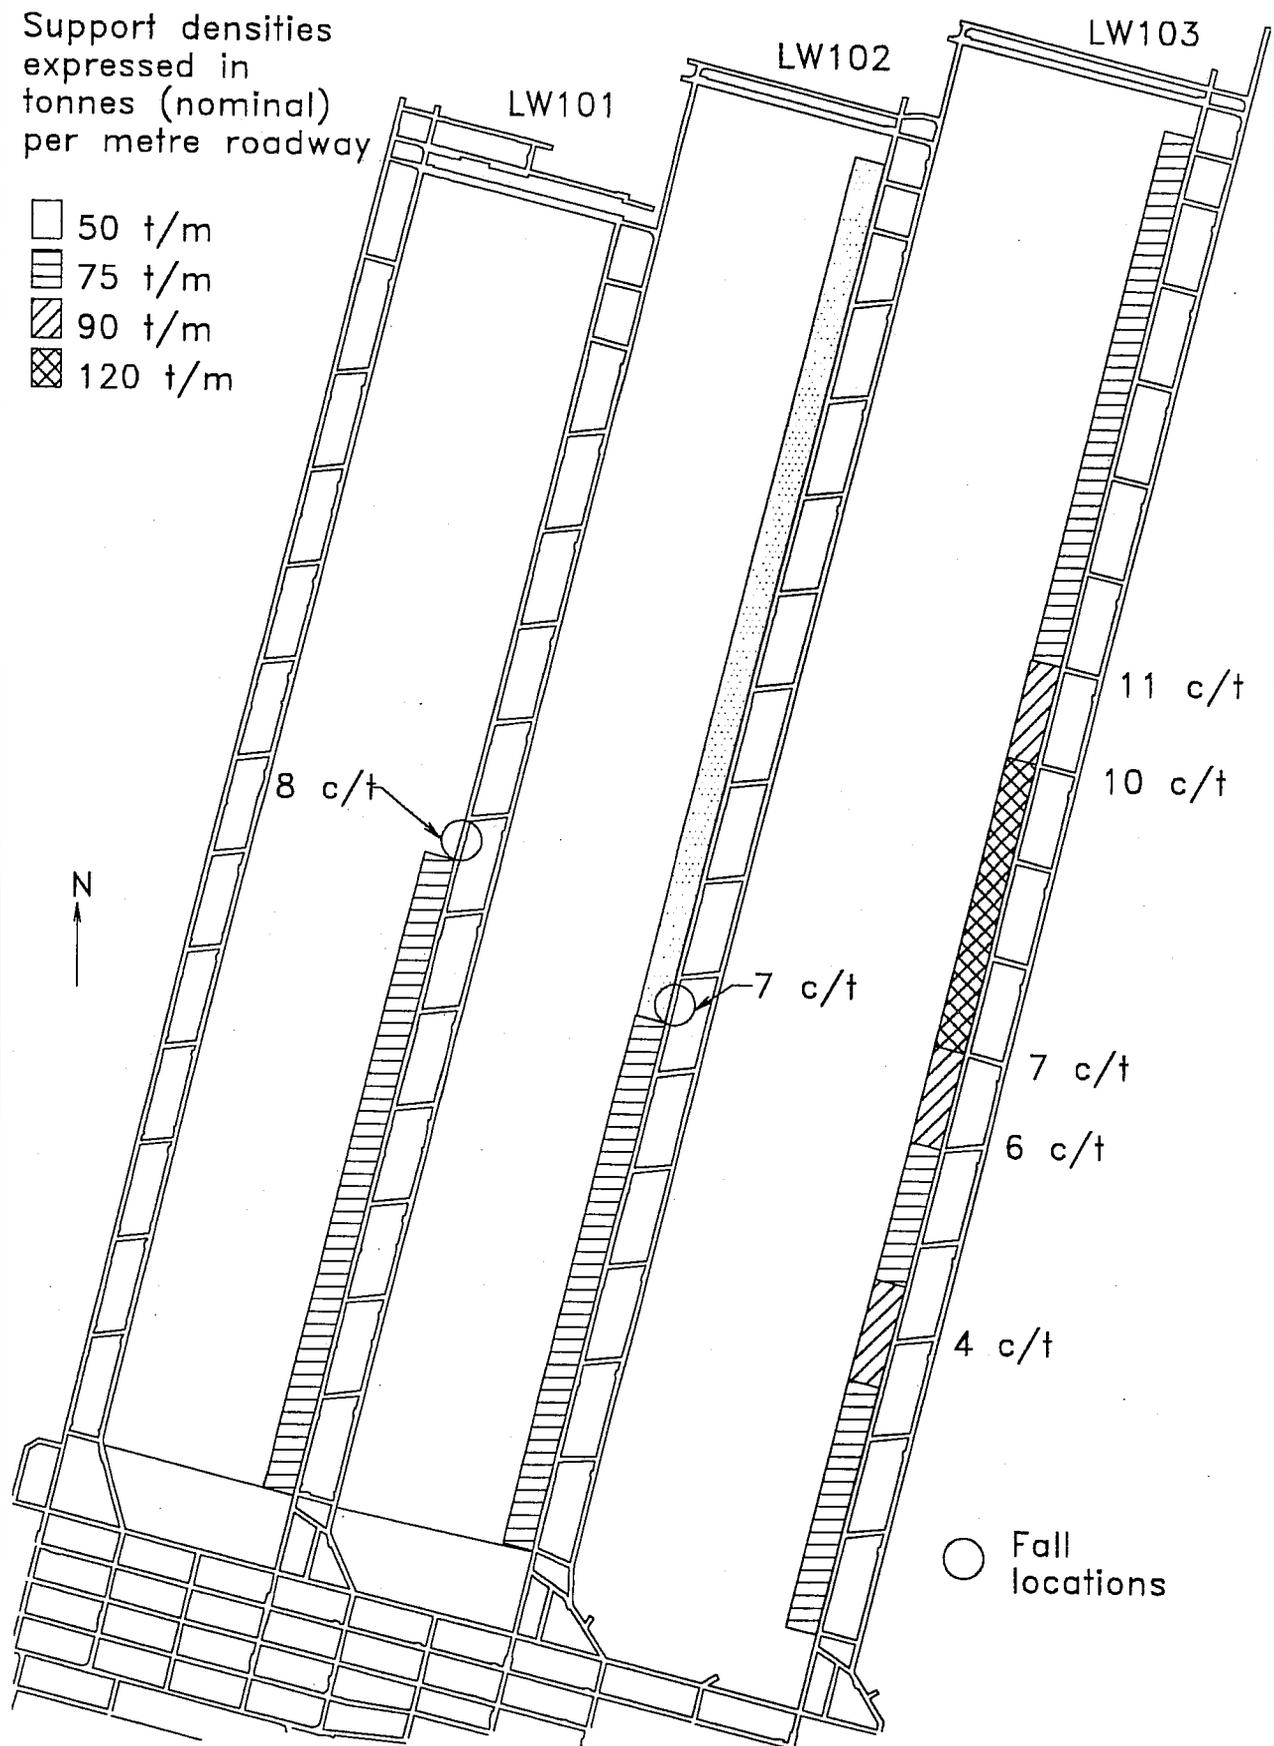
Gordonstone longwall gateroad secondary support densities and MG fall locations.
